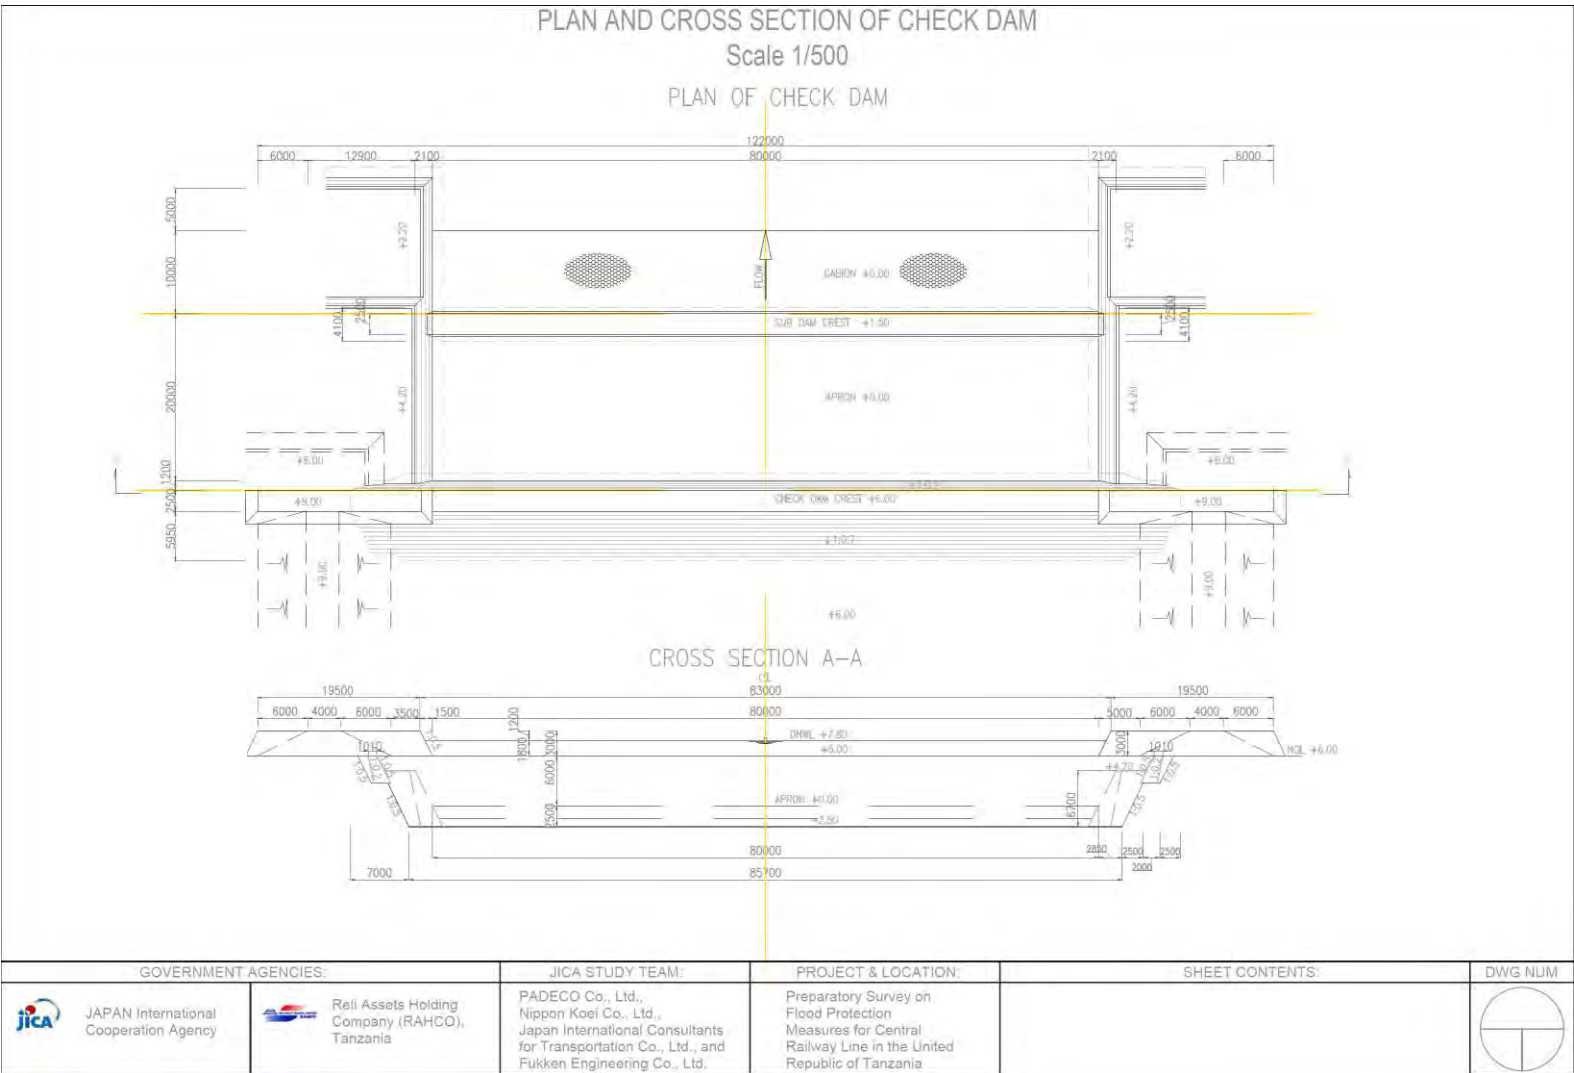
Plan and Typical Section of Check Dam in Maswala River Training Works
